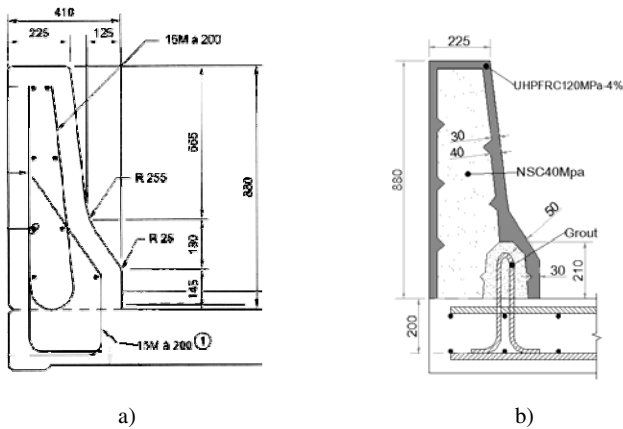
Parapet design, a) Cast-in-place parapet, b) Hybrid UHPFRC precast parapet
